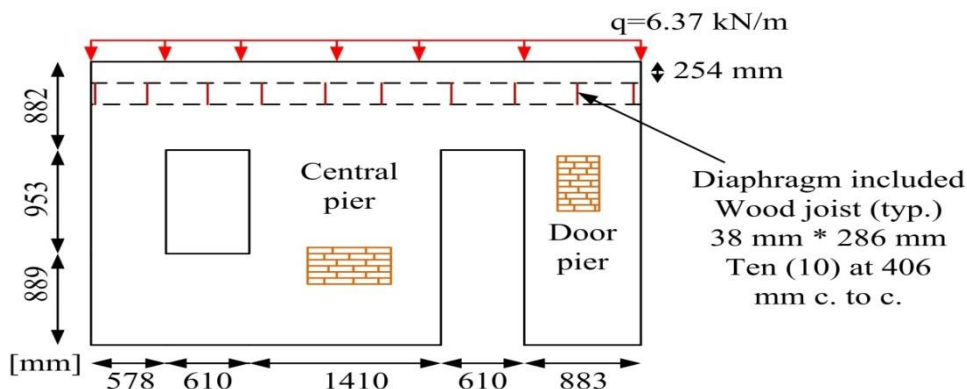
Dimensions of the west wall in mm (Akhveissy, 2012b)
